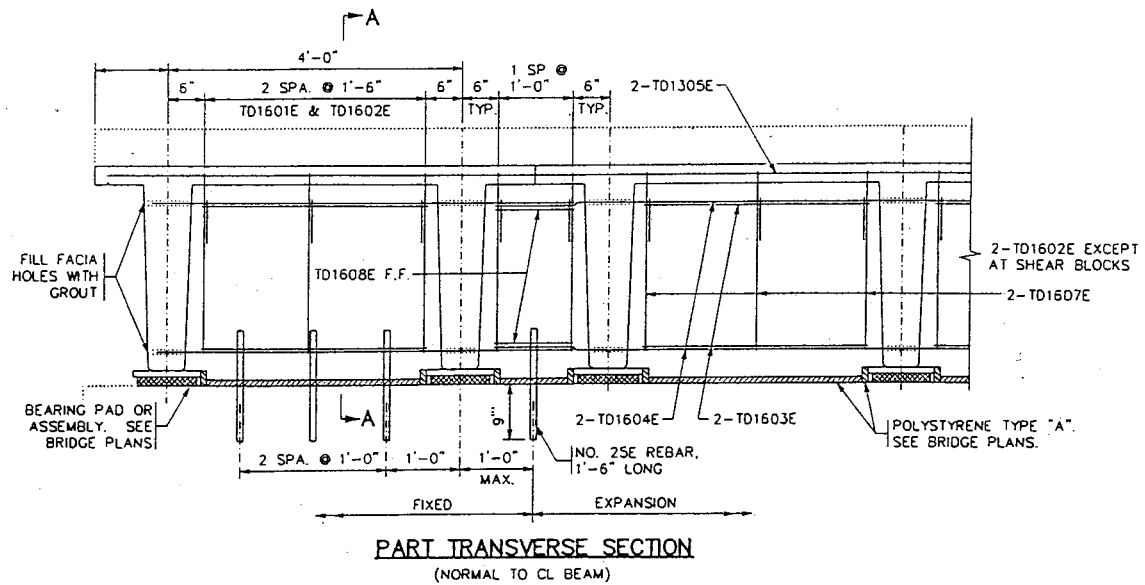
Concrete pier diaphragm used by Minnesota DOT
